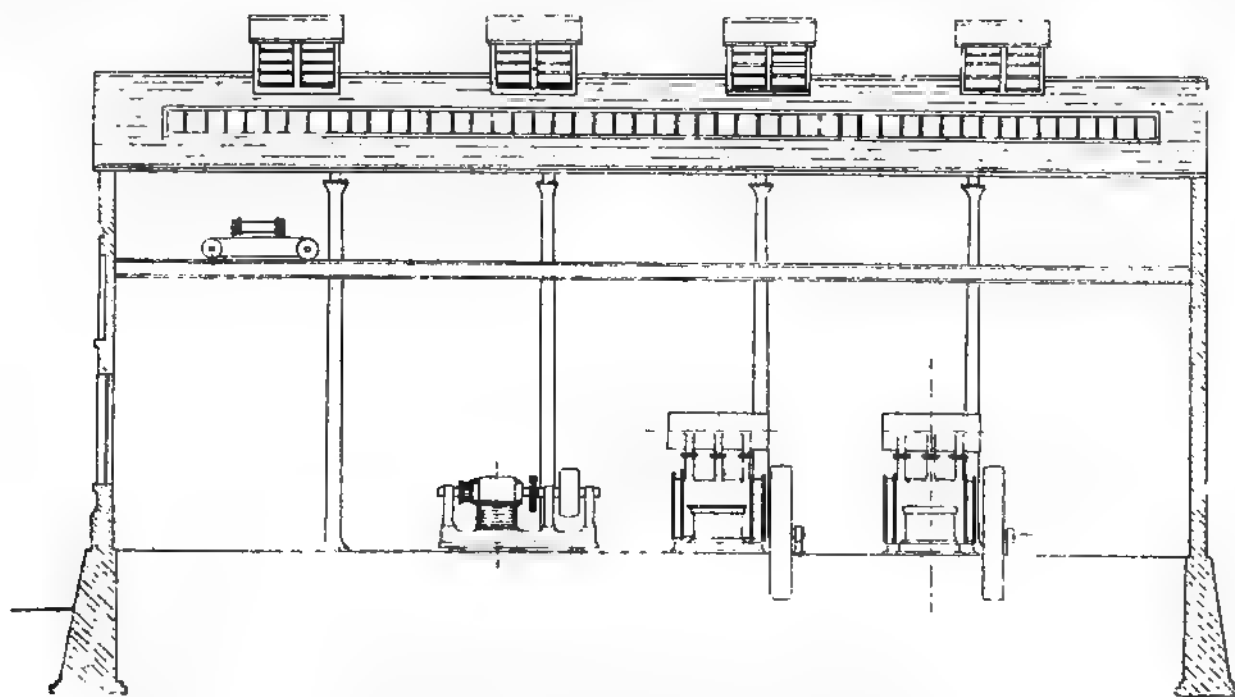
Sectional Elevation through Engine-Room, showing also Ventilators and Skylight.
